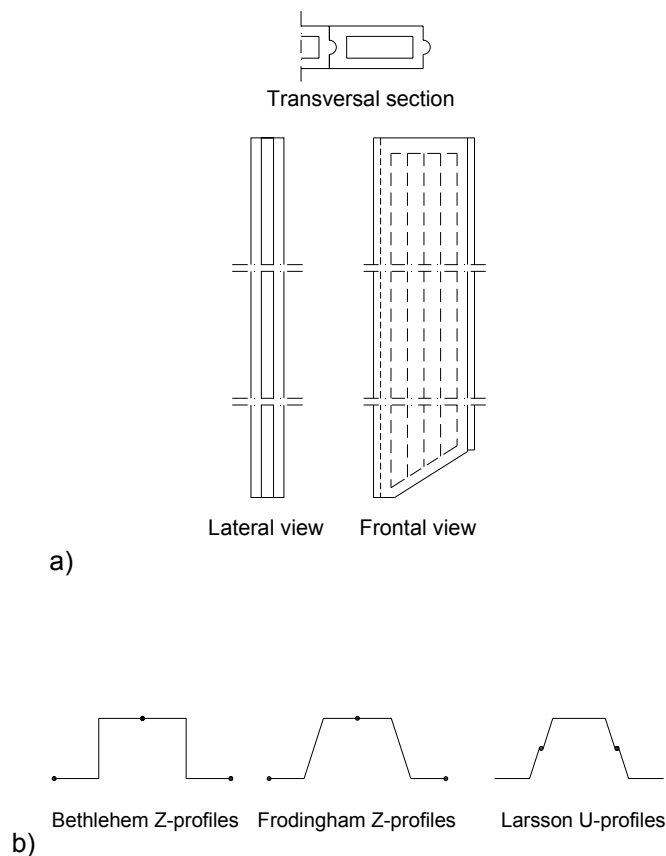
Elements for sheet piles walls: a) reinforced concrete; b) steel.
